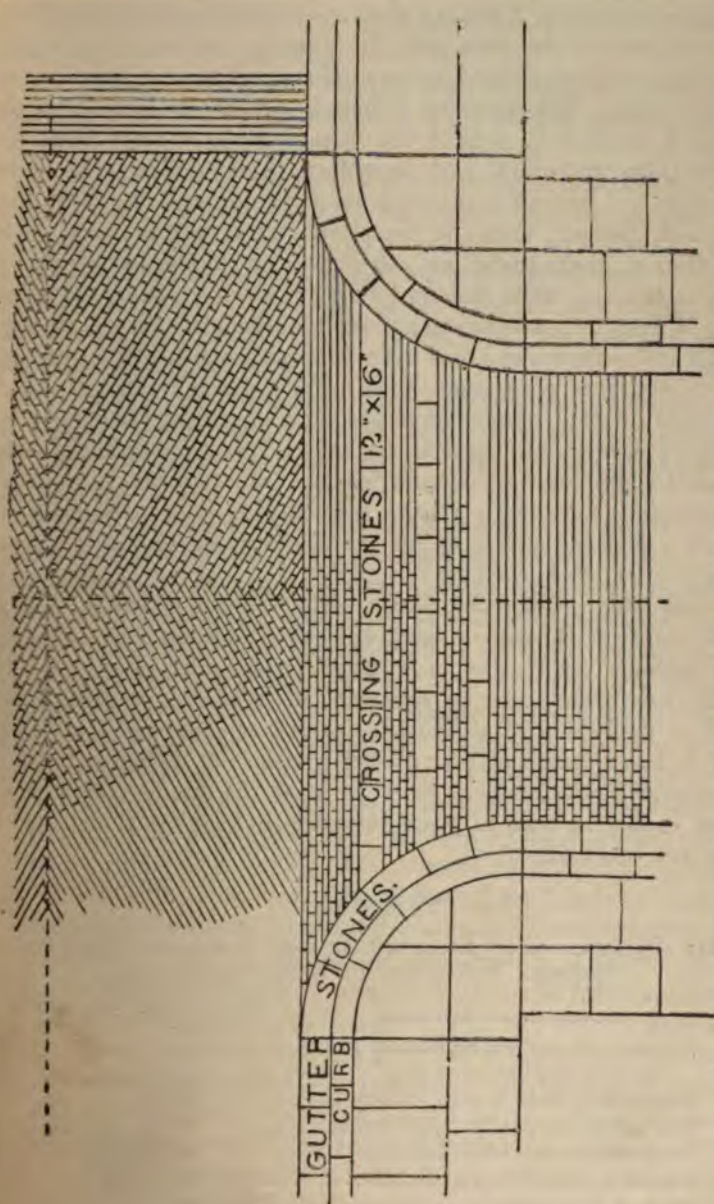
A.—STREET INTERSECTION PAVED WITH GRANITE BLOCKS.
